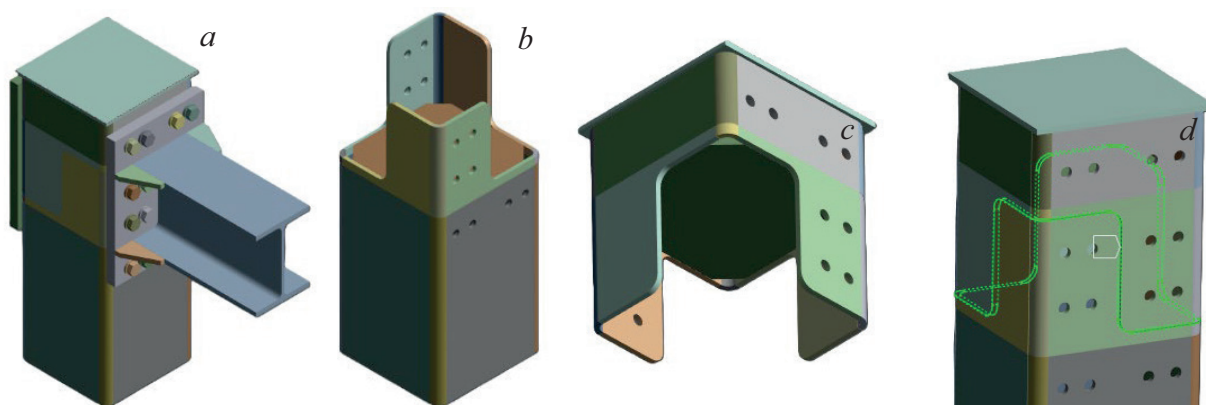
1 variant. Column with the meander outline: a – assembled butt joint, b-c – jointed parts, d – outline of the cut
